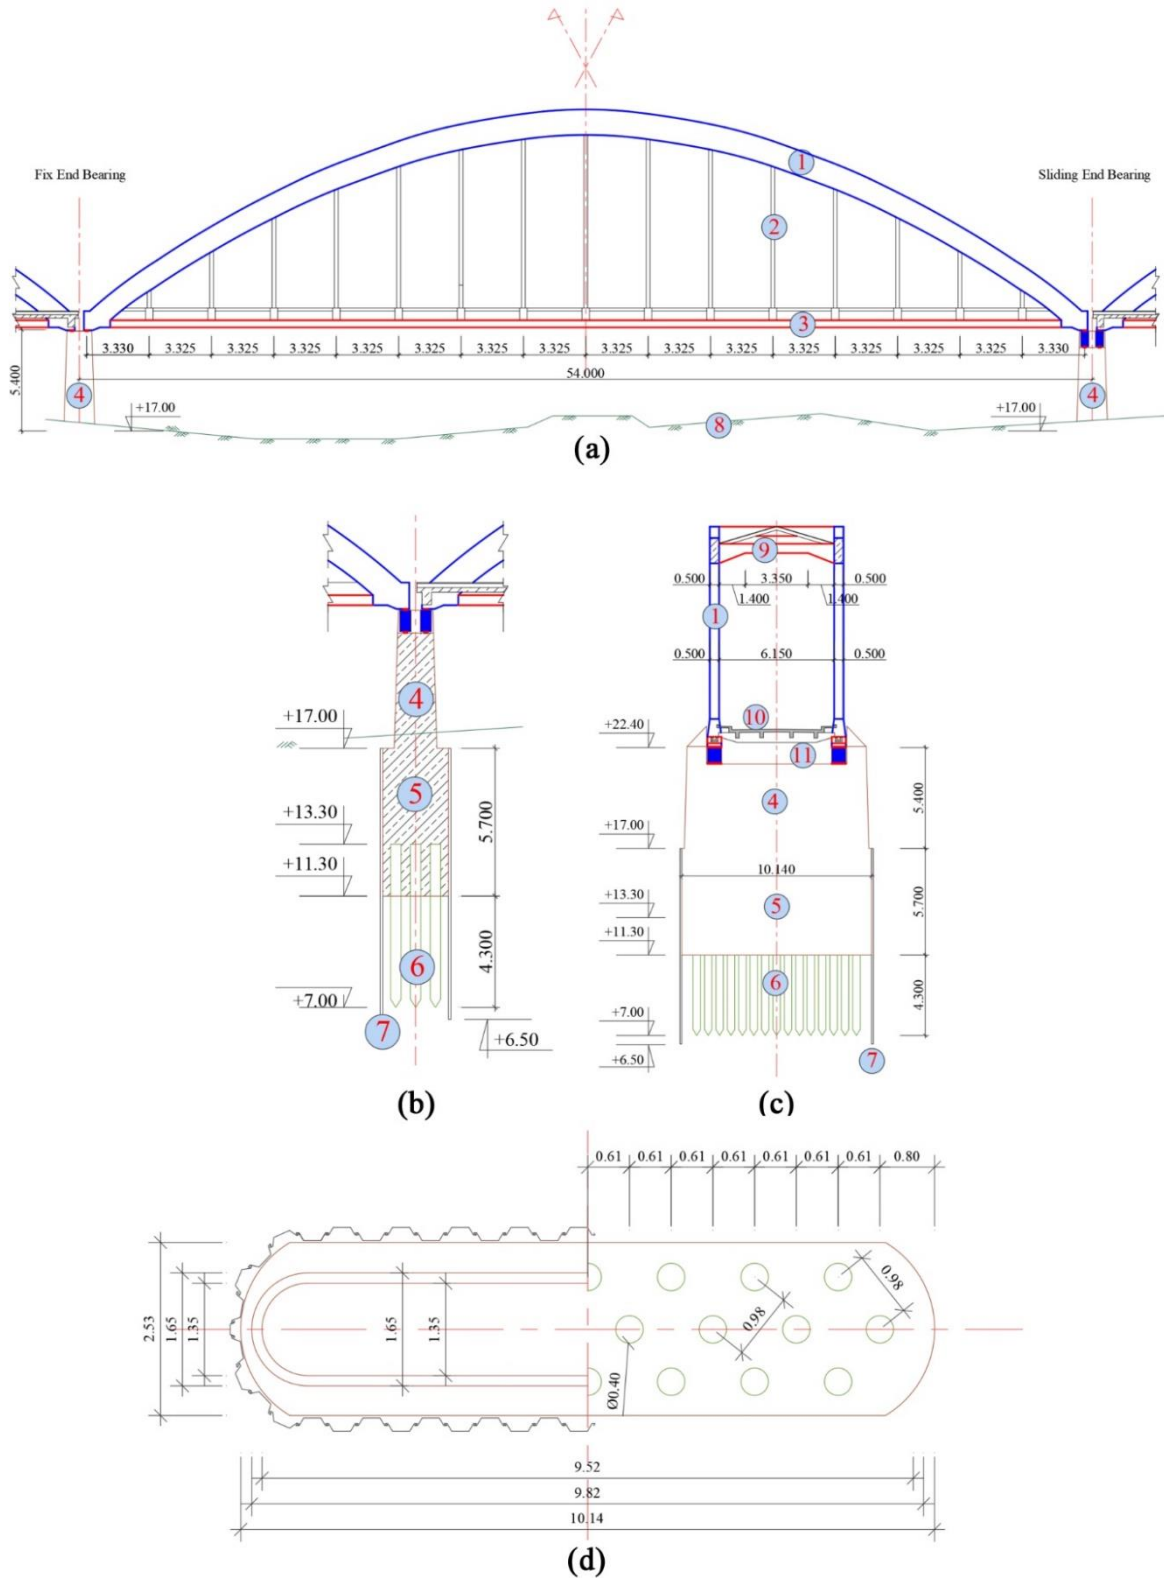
Ura e Zogut bridge blueprints. (a) Single span longitudinal view. (b) Foundation sectional view. (c) Single span sectional view. (d) Foundation plan view
